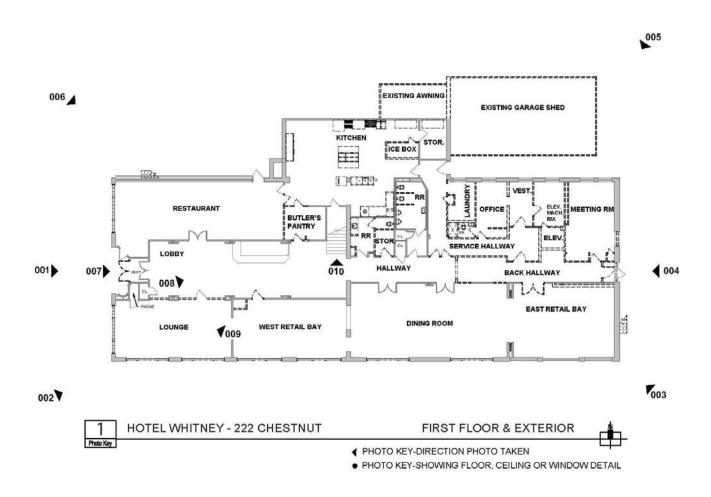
1st Floor Plan showing location of photos at 1st floor and exterior. Source: Alley Poyner Macchietto Architecture, 2016.
